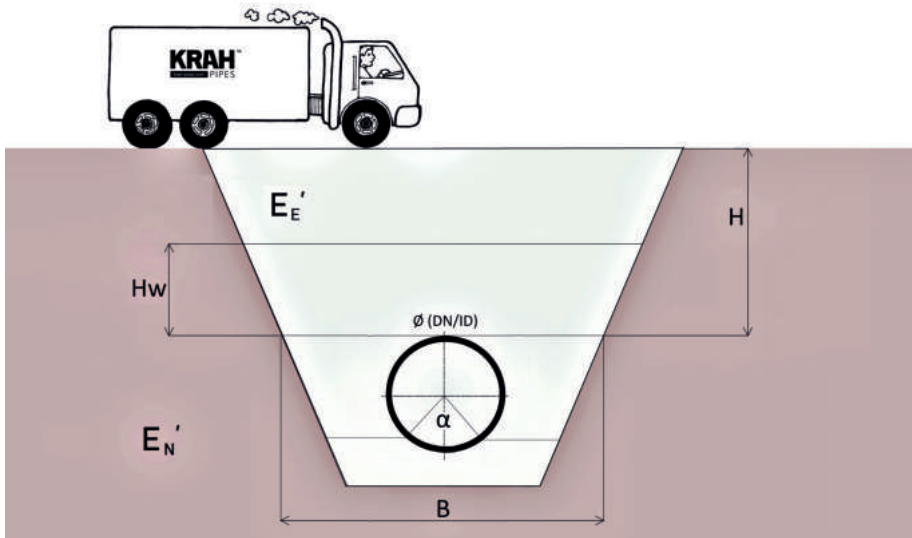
Sketch for installation and trench and a schematic load above the pipe
